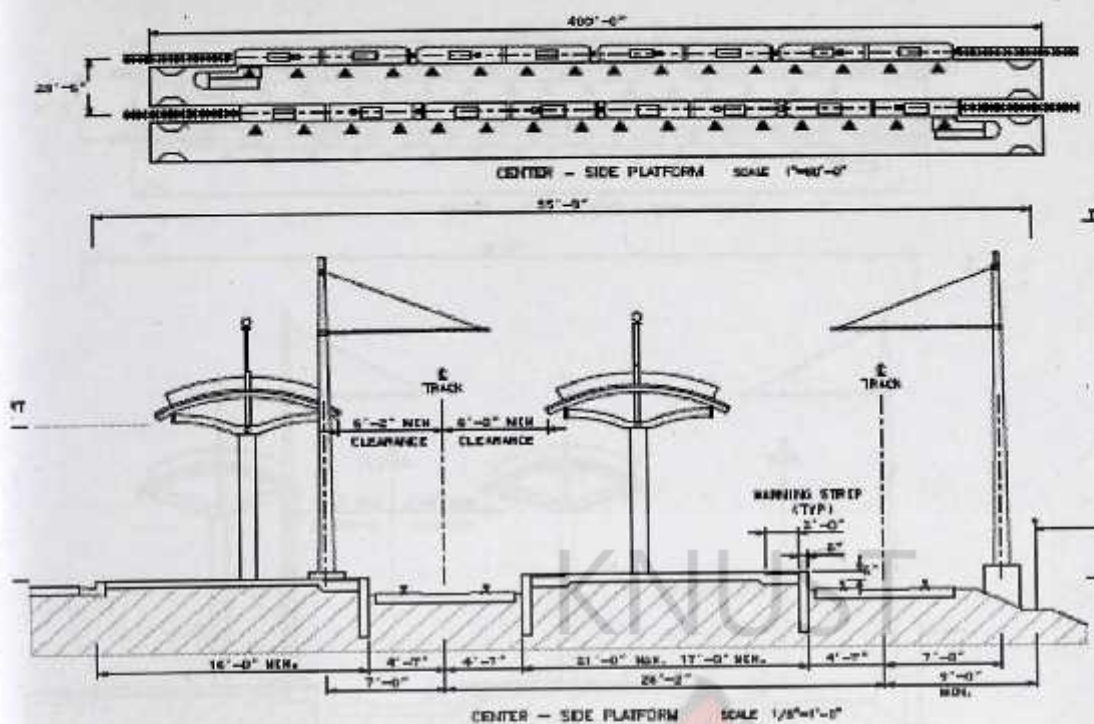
A typical section through a side platform (Source: Terminal Architecture and Engineering)
